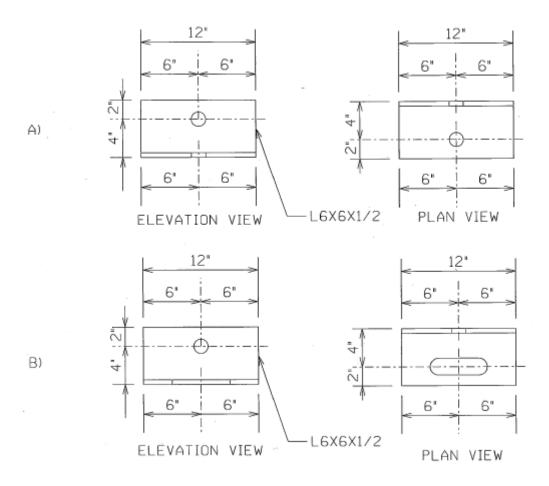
Little Bear Creek Abutment Connection for Type III Girders
